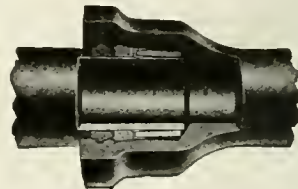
PREPARED JOINT 2-IN. CAST IRON PIPE CUT OPEN TO SHOW POSITION OF JOINT MATERIALS.
